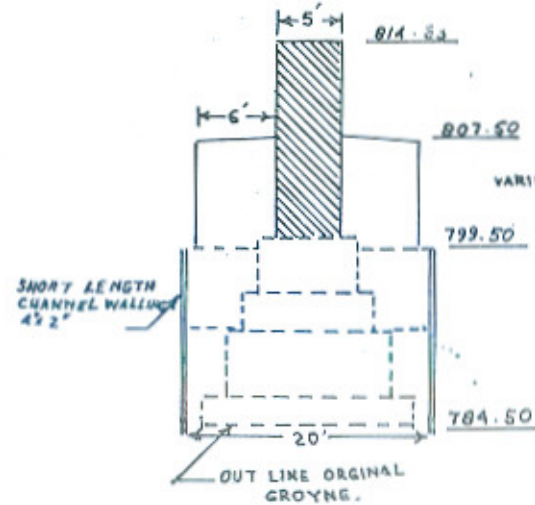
# DETAIL OF LEFT DIVIDE WALL MARALA BARRAGE
